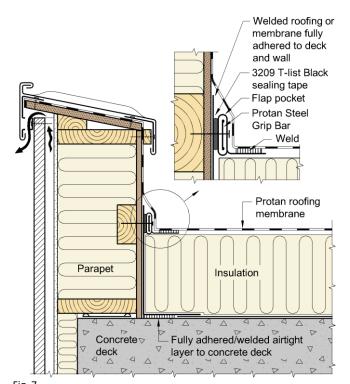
Sealing principle for edges on a concrete roof deck. New building.
